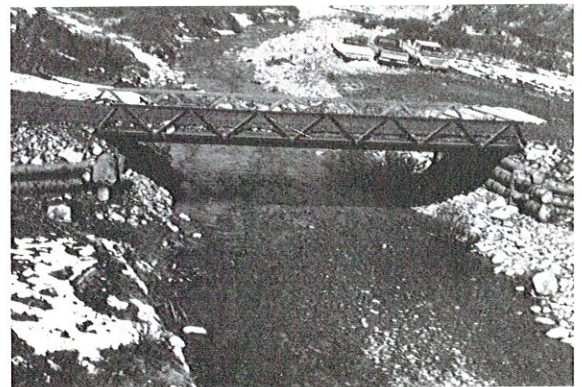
PORTABLE BRIDGE. Simple log cribs were constructed to hold the portable bridge.
